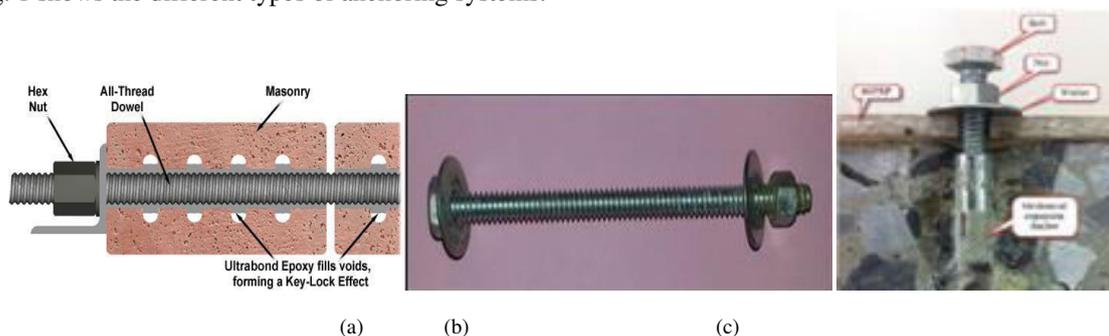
(a) Epoxy Bolt Anchoring Systems (b) Through Bolt Anchoring Systems (c) Mechanical Expansion Bolt Anchoring systems
